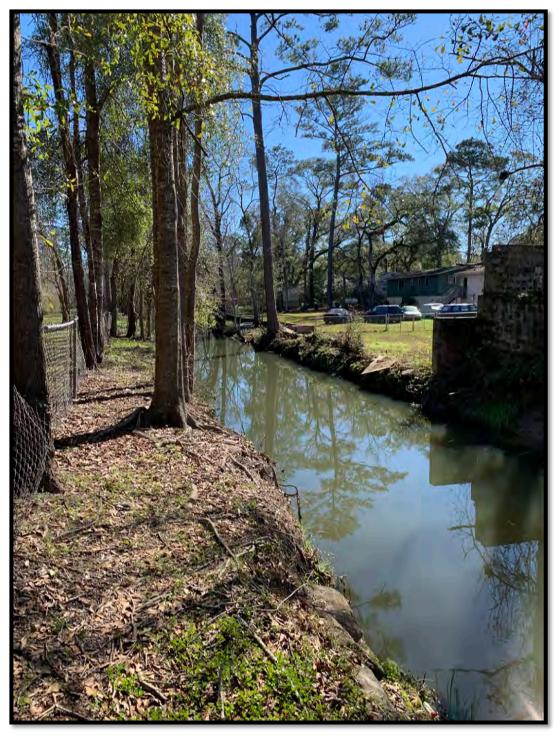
Photo of Silver Lake Outflow Canal Immediately Upstream of North Ridge Road (2021)
